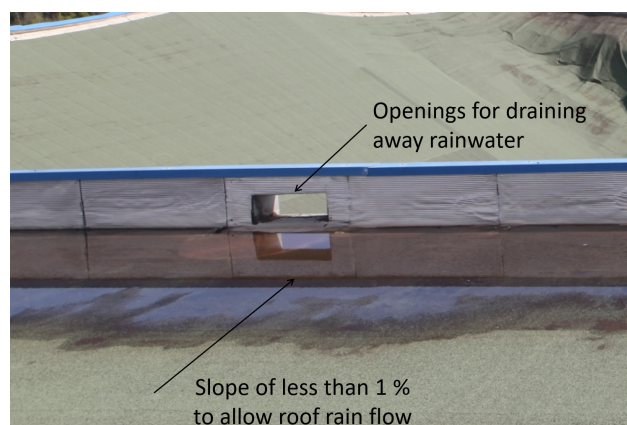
Close-up view of the roof rain drainage system of the Irstea Cévennes building.
